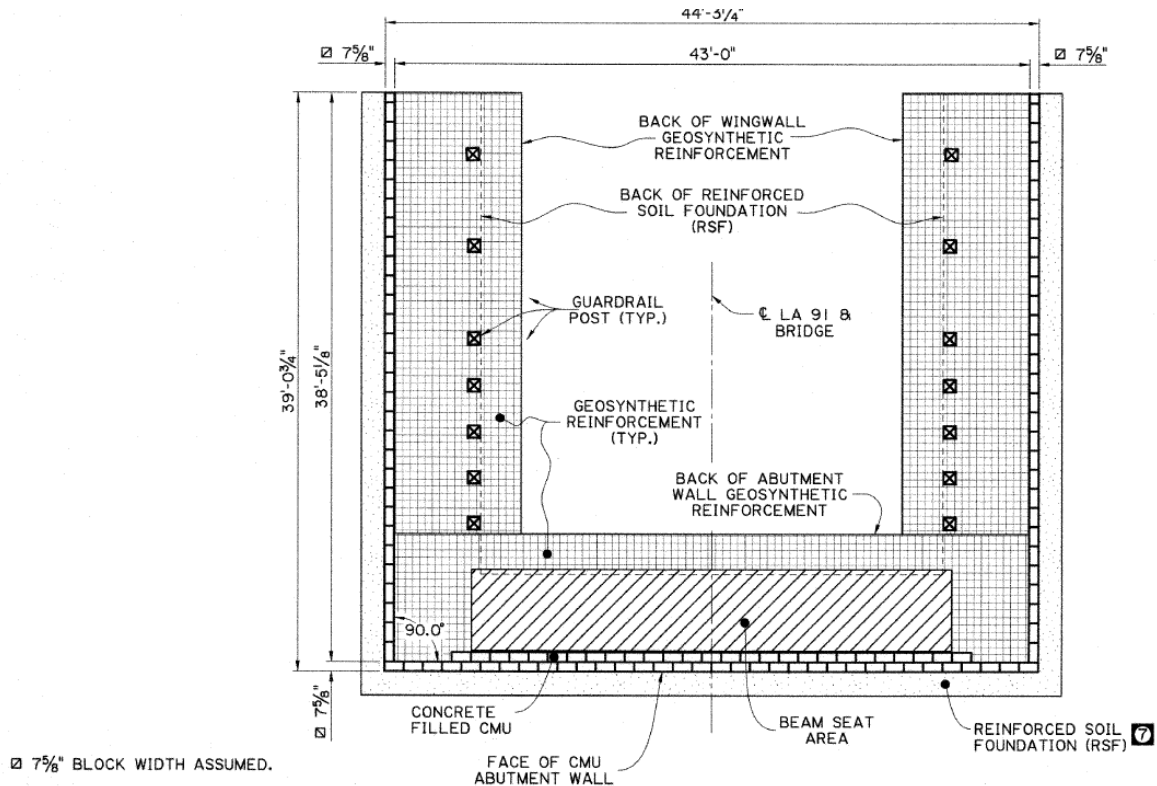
Diagram. GRS abutment plan view of Maree Michel Bridge.
